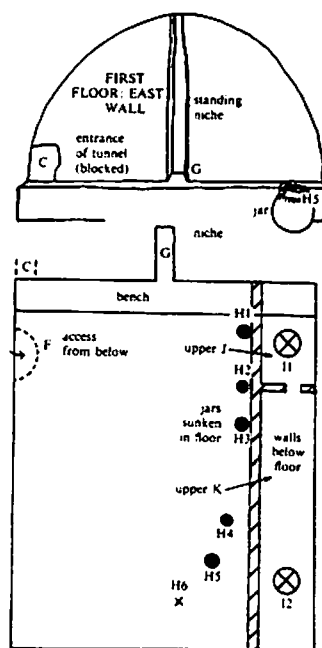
Plan of the 'Cell of Gabriel', upper floor
